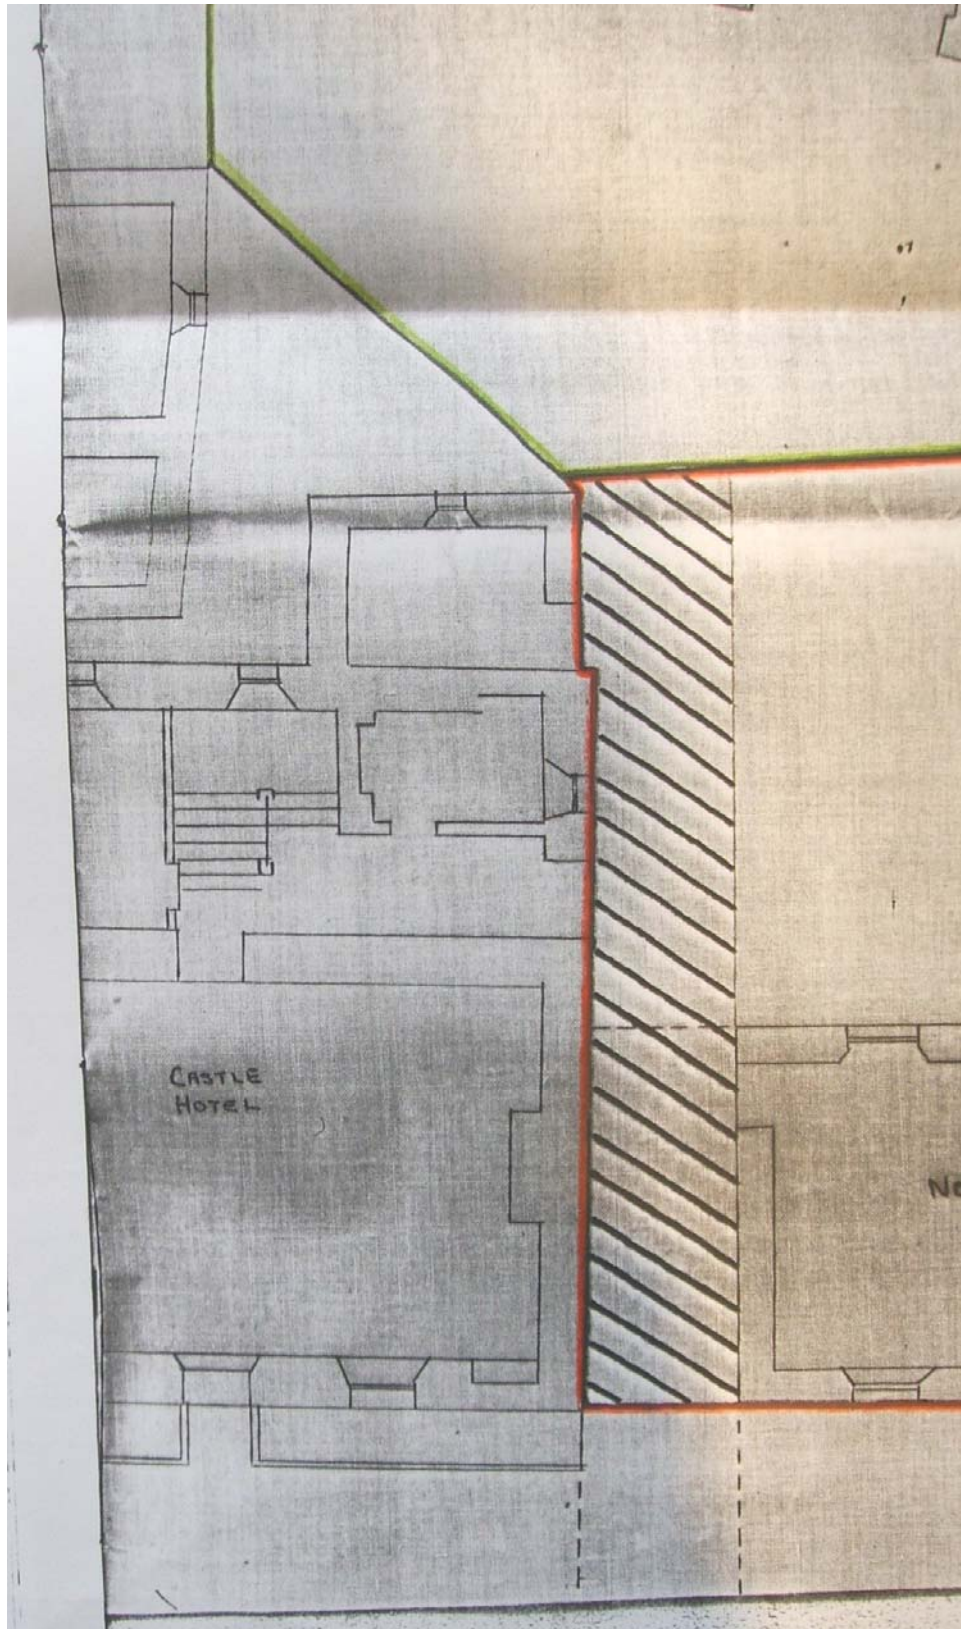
Plan of 1973 include with the deeds showing part of the ground floor interior of the central section of The Castle Hotel (Building 2)
